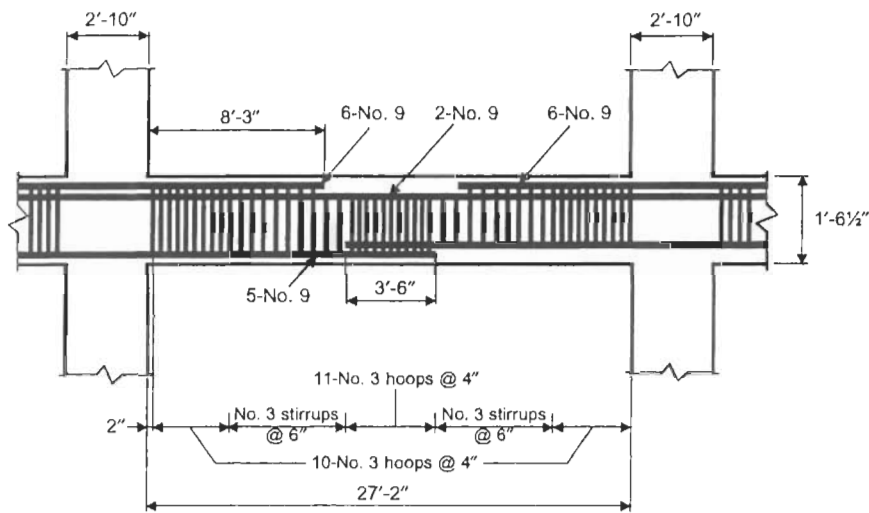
Reinforcement Details for Beam B3-C3 at Floor Level 1 (SDC D)
